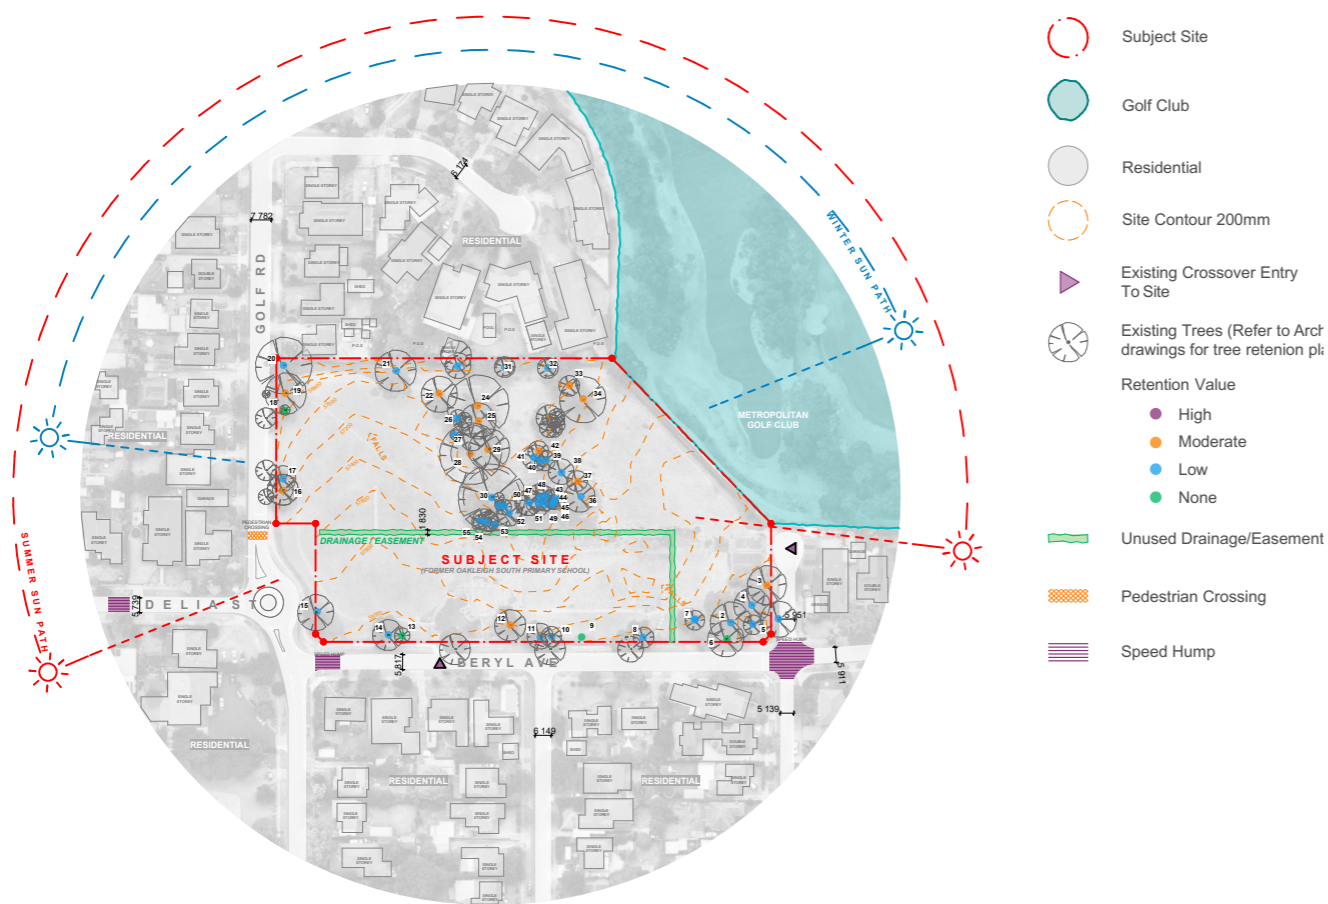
Site Analysis Plan (Source: Plus Architecture)
